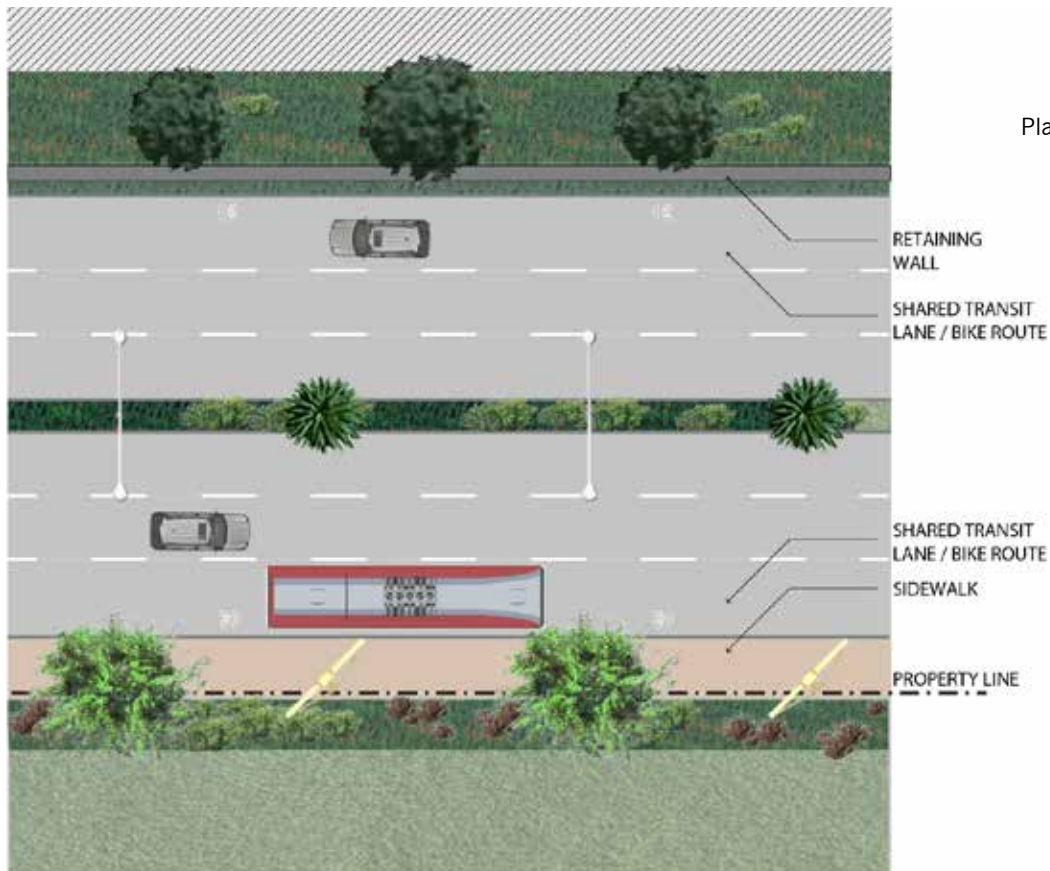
Conceptual plan of Universal Hollywood Drive reconfiguration
